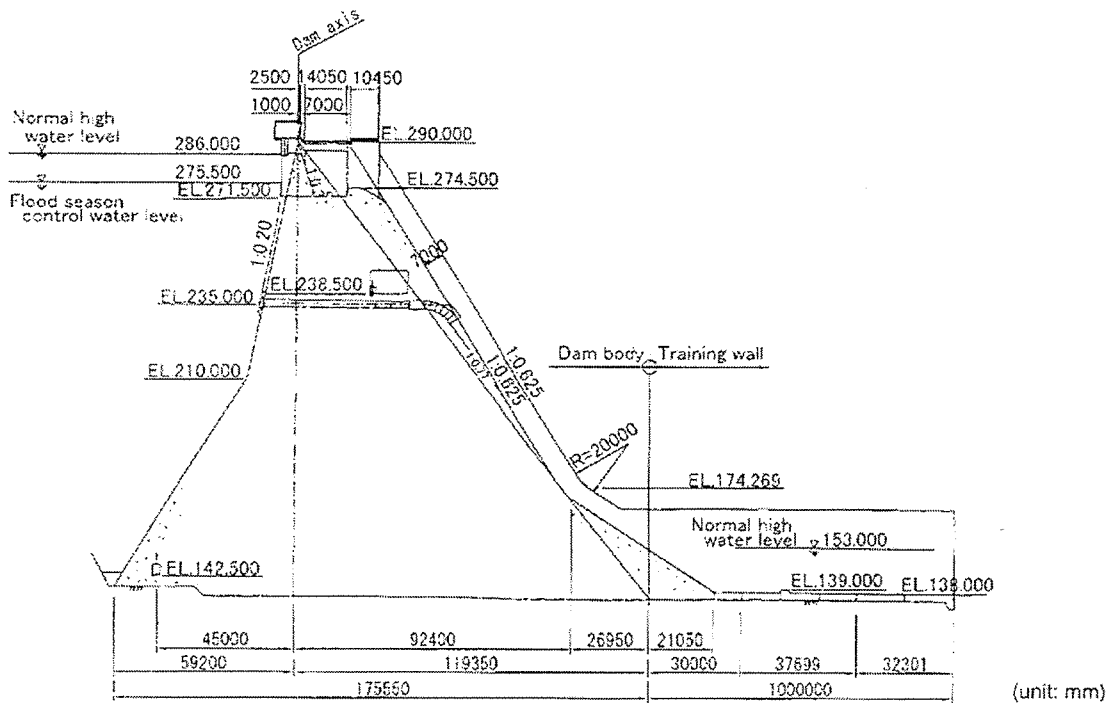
Typical Cross section of RCD (Miyagase Dam)
